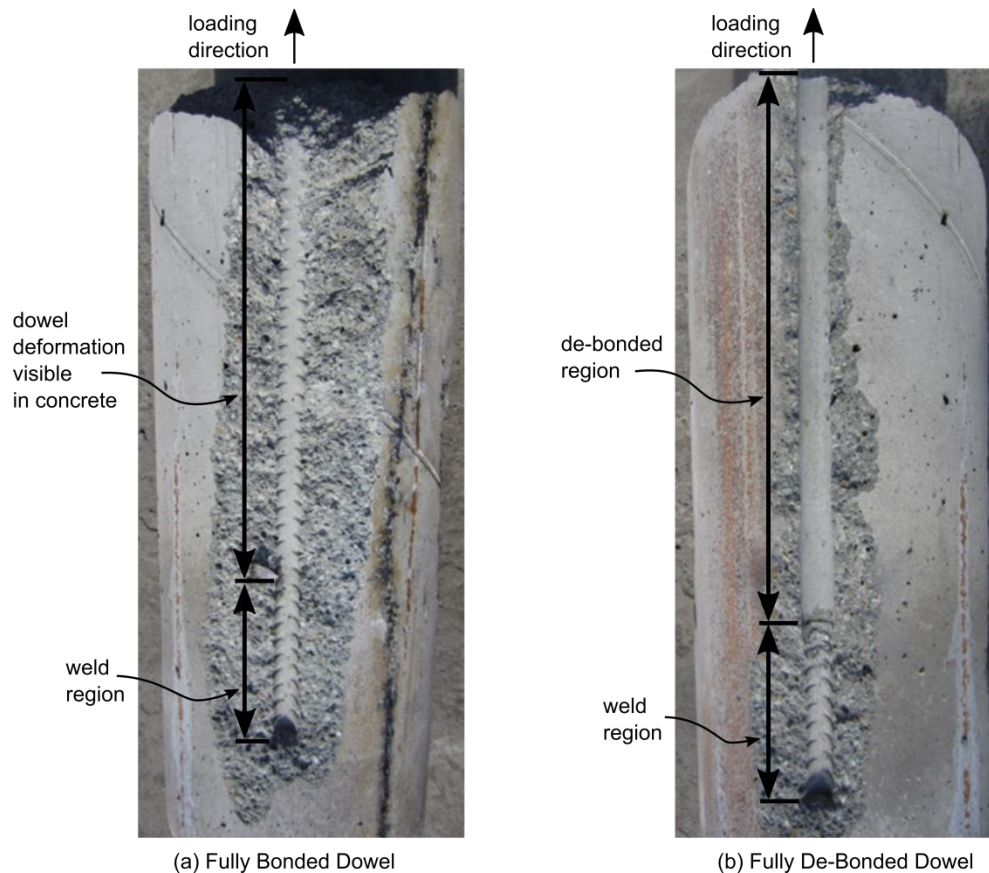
Concrete Damage in Pullout Specimens with (a) Fully Bonded Dowel and (b) Fully De-bonded Dowel
